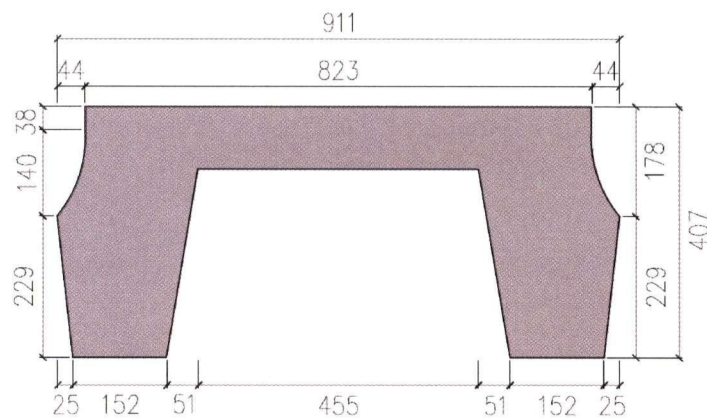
Detailed Dimension of Channel Beam Cross Section
